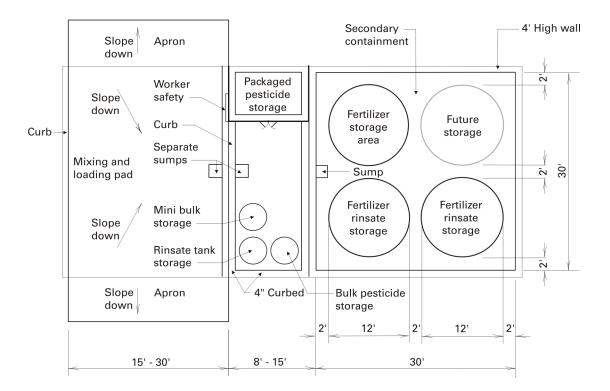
Medium-scale facility, plan view. Optional roof over entire facility.
